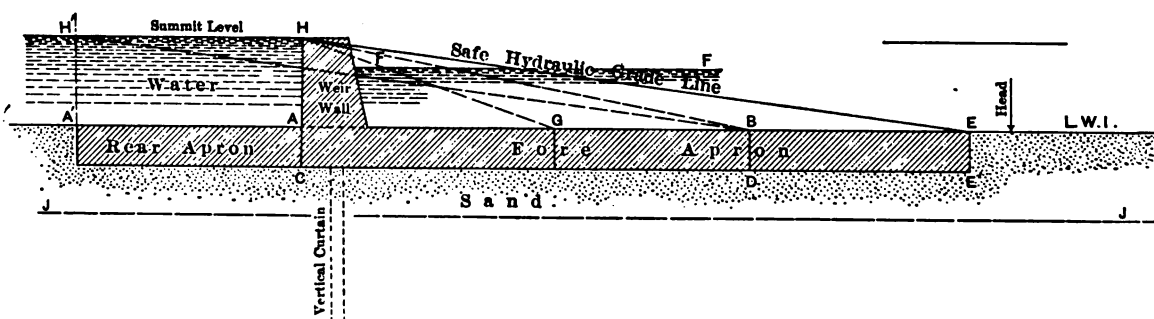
OVERFLOW WEIR ON SAND FOUNDATION.
